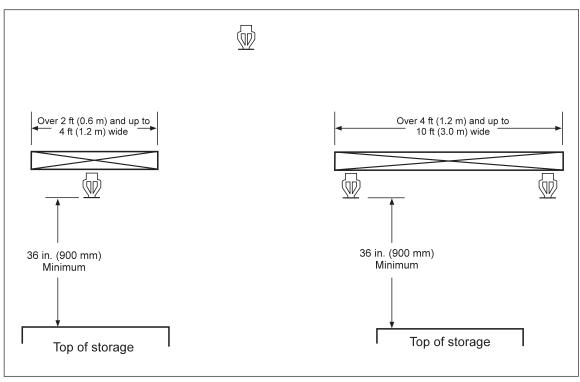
Additional sprinklers installed below flat, continuous, solid obstructions from over 2 ft (0.6 m) wide to 10 ft (3.0 m) wide
